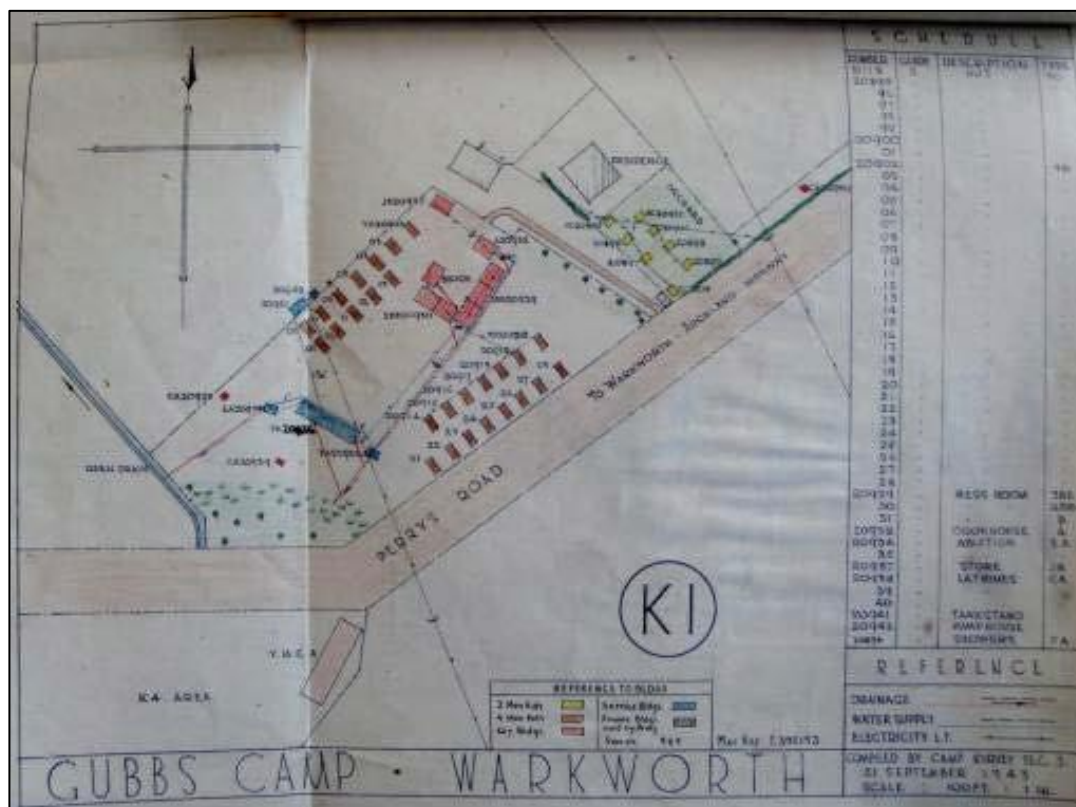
Plan detailing the layout of Gubbs Camp K1, situated along Perry Road (source: Archives New Zealand, ACIO 8722 6/ 79/1)
